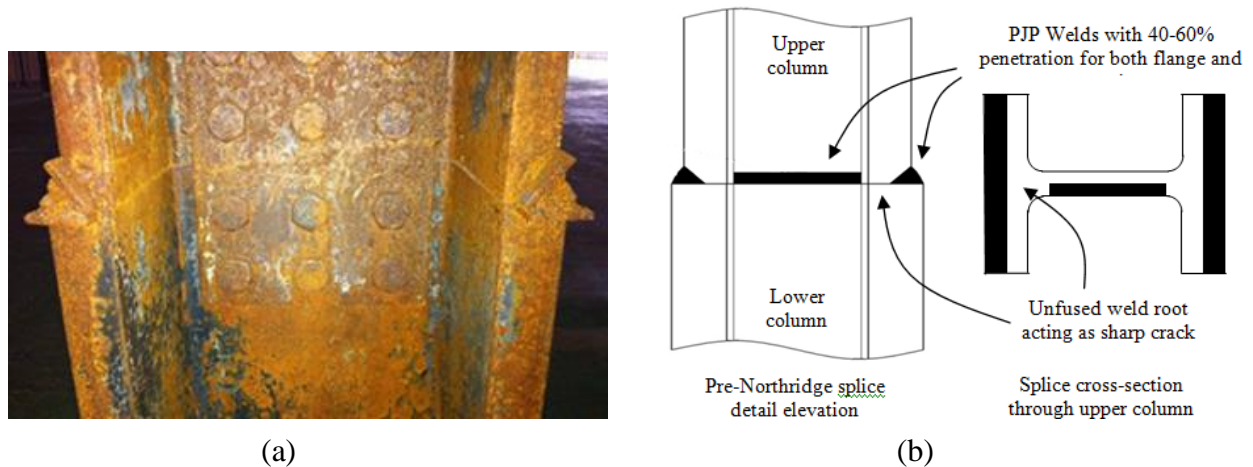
Partial Joint Penetration (PJP) welds in pre-Northridge Steel Moment-Resisting Frame (a) actual splice WCSs (Forell/Elsesser Engineers, 2016) (b) schematic of splice (Kimberly, 2015)
